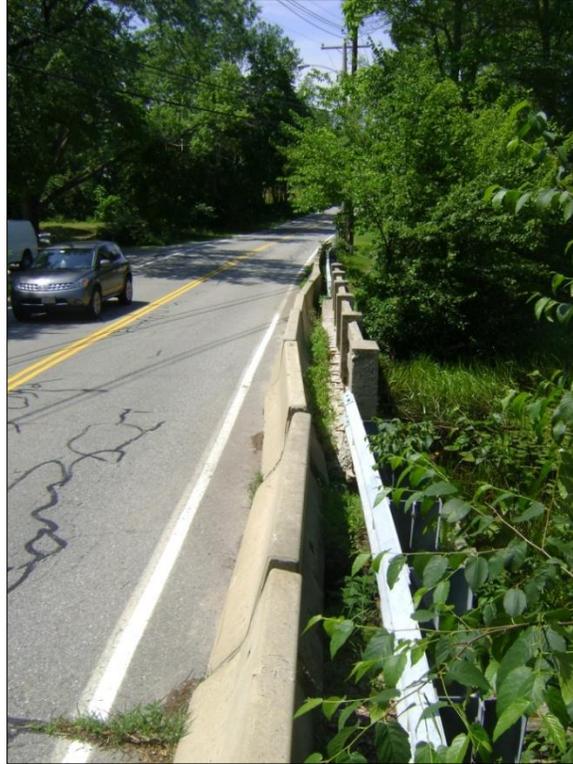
Looking West: North Bridge Rail and Jersey Barriers
